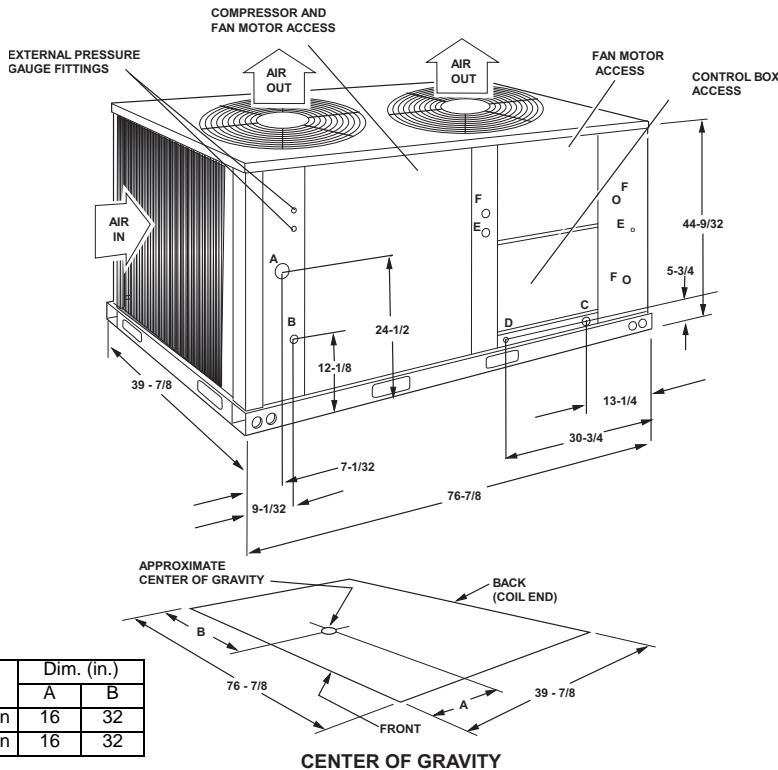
UNIT DIMENSIONS AND CLEARANCES
